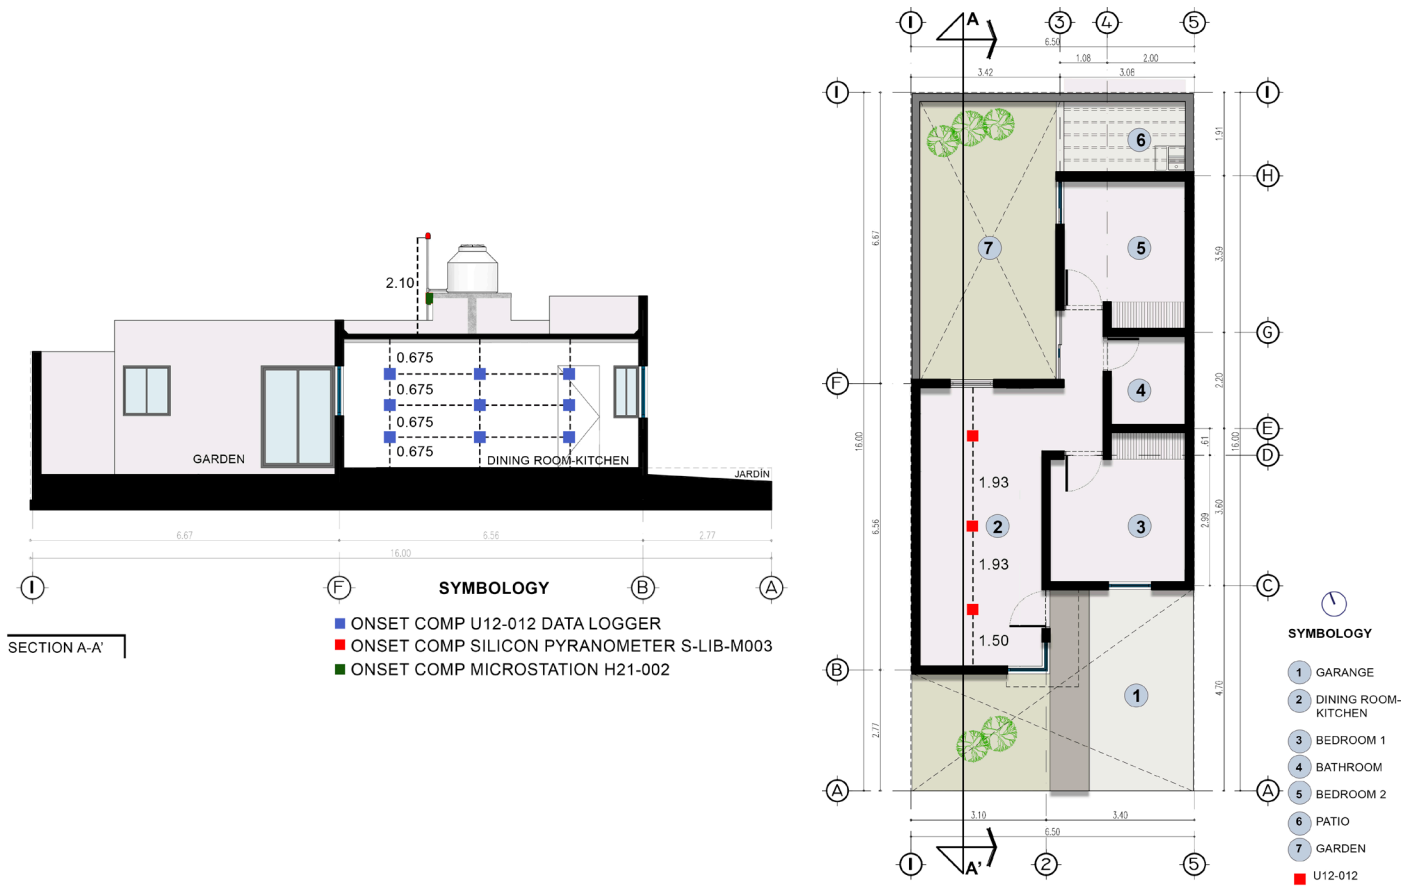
Low-income house at Valle del Sol, Colima, Mexico. a) House layout with measurement instruments, section A- A'. b) Floor plan.
